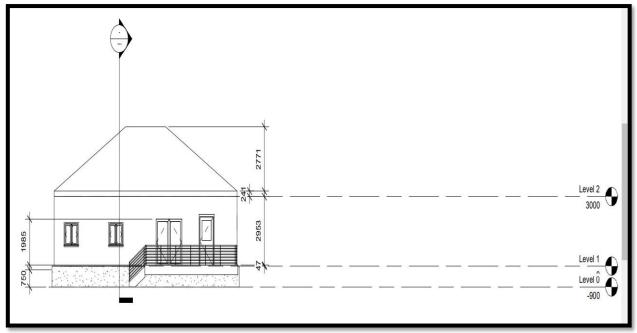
ELEVATION OF MODAJ VILLAGE BANK
